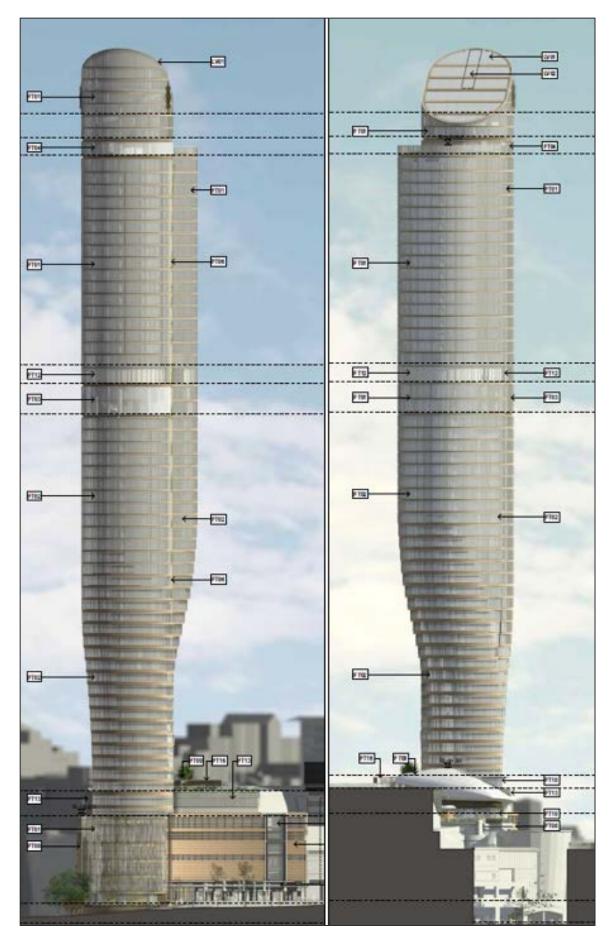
| north (left) and south (right) tower elevations (Source: Proponent's Architectural drawings)
